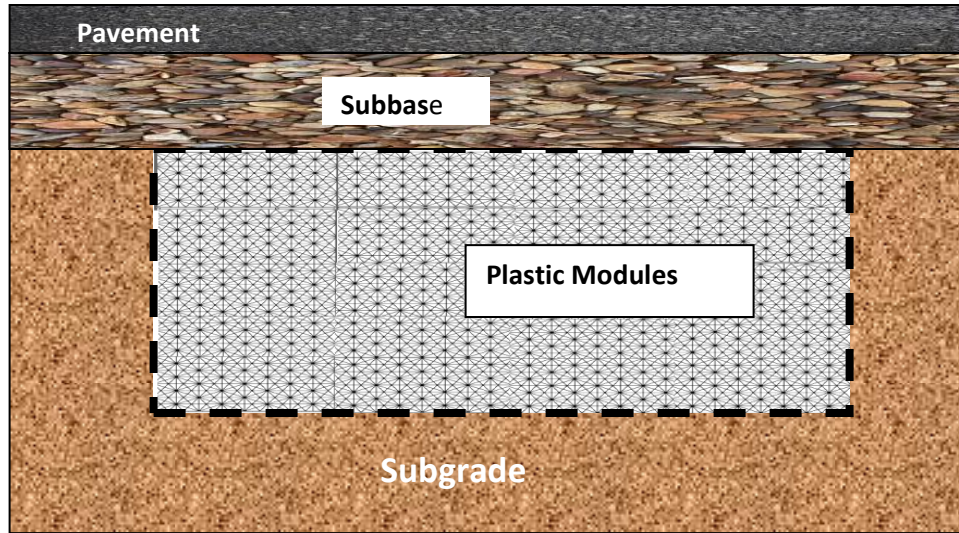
Typical Cross Section of a Plastic Stormwater Module
